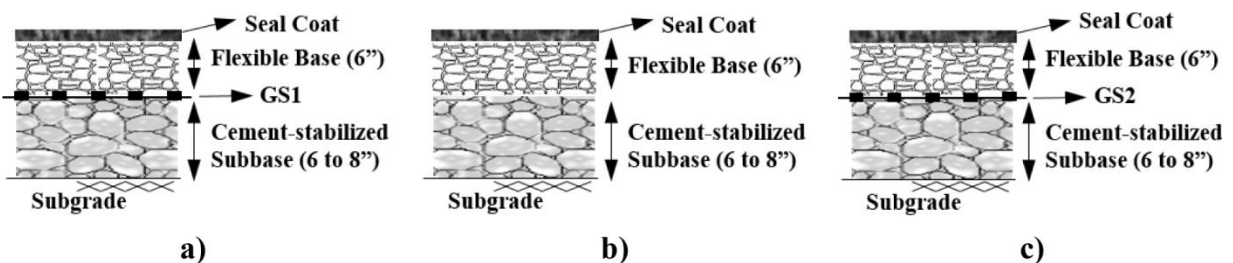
Design profiles of test sections: a) Section 1 (stabilized using GS1); b) Section 2 (Control Section); c) Section 3 (stabilized using GS2).
